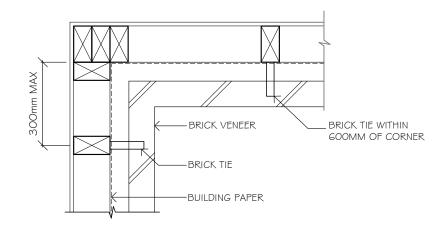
(D10) TYPICAL WALL SECTION DETAIL-BRICK SCALE 1:5
